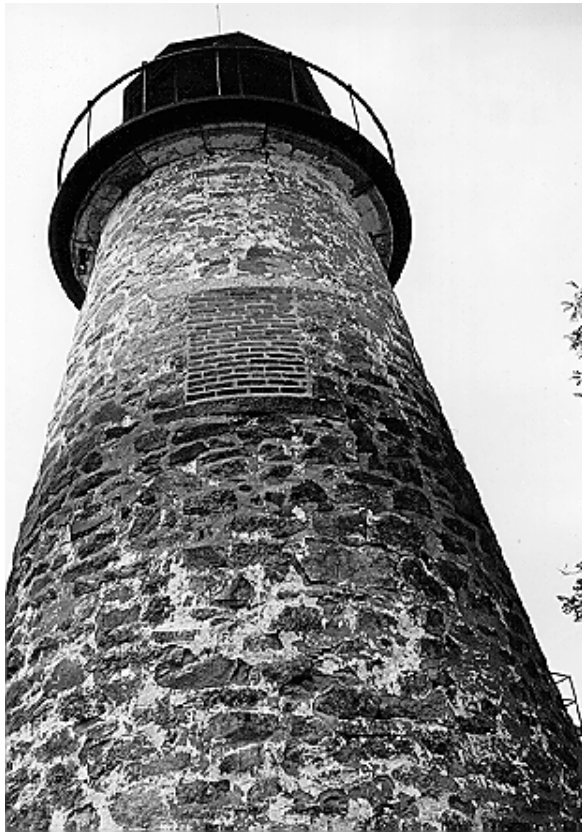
An example of a reversible masonry stabilization treatment for the window opening that has prevented structural deterioration and moisture infiltration.
